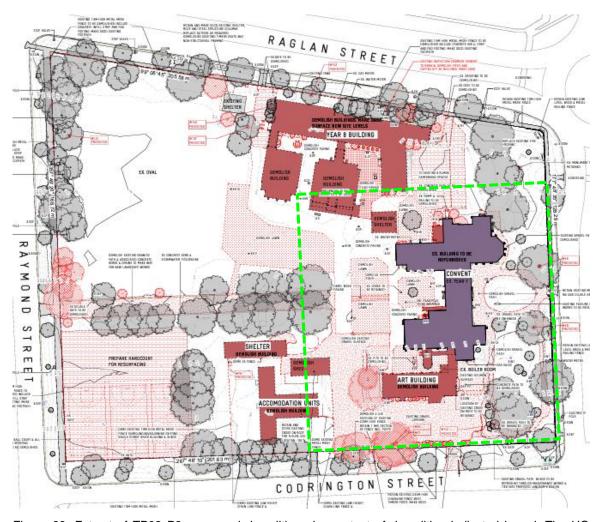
Extract of TP02 P2, proposed demolition plan, extent of demolition indicated in red. The HO curtilage is indicated in green, and the Convent building in purple. Source: Y2 Architecture, 2023.
